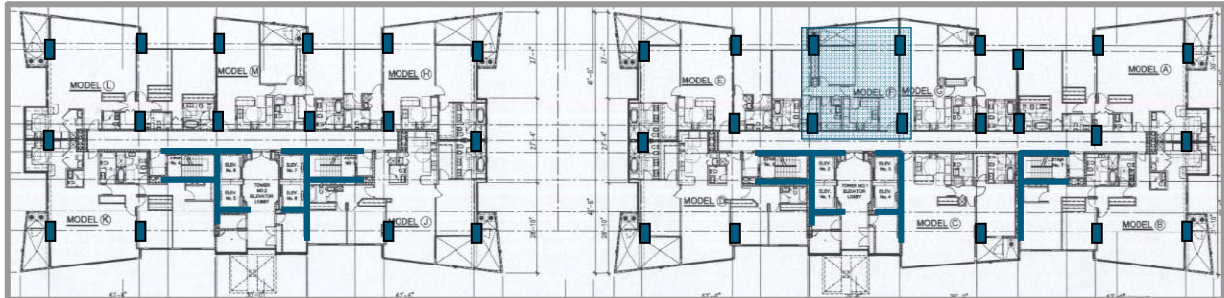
Column and Shear Wall Layout for Typical Apartment Level
